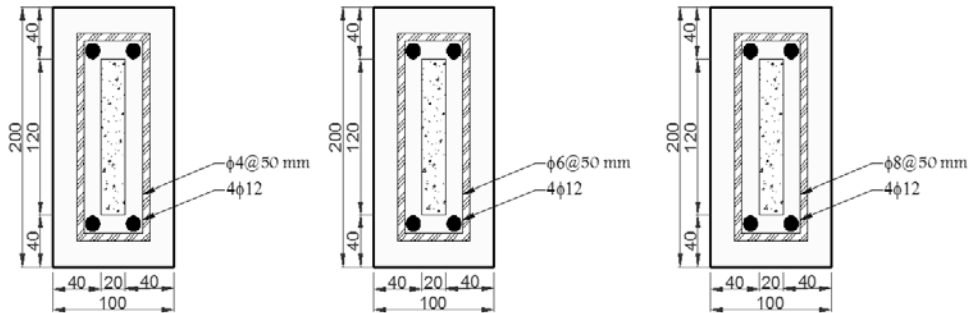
Hybrid beam with different transverse reinforcement (stirrups).
